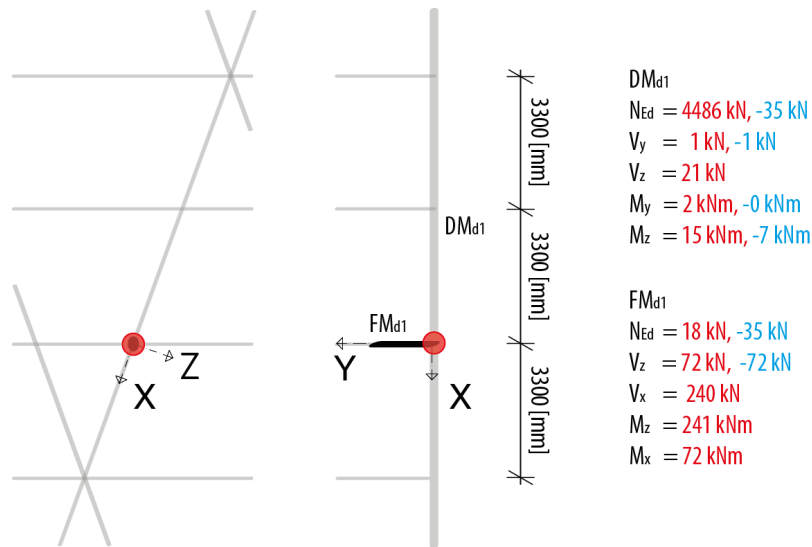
Detail 1, normative load attached floor beam (Local coordinate system).
